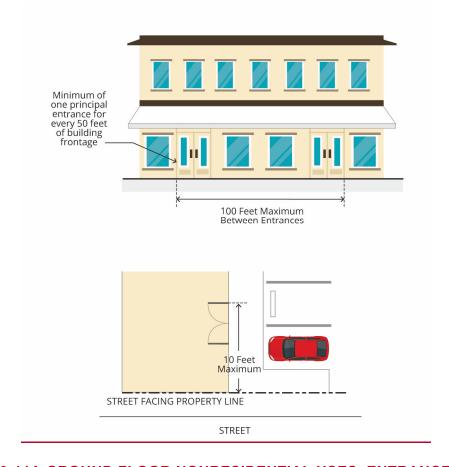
A GROUND FLOOR NONRESIDENTIAL USES, ENTRANCE DESIGN
